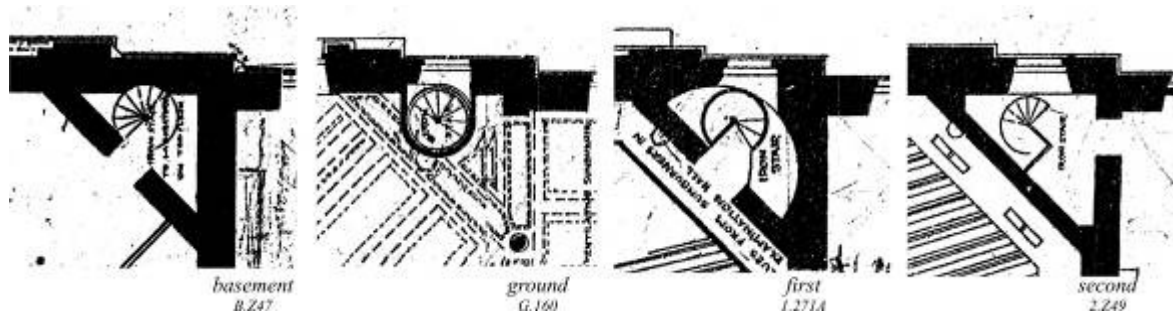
Room 2.Z49 extract from University plans of 1895 showing stairwell
